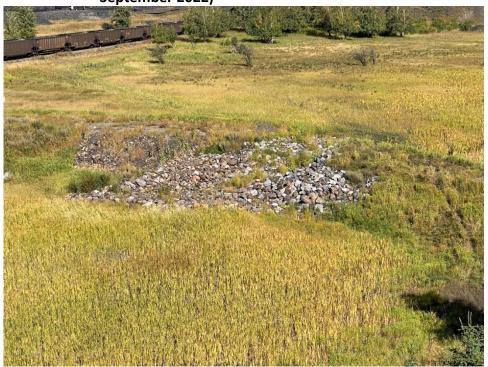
Lagoon A spillway and spillway riprap. (Looking south – Taken 20 September 2022)
